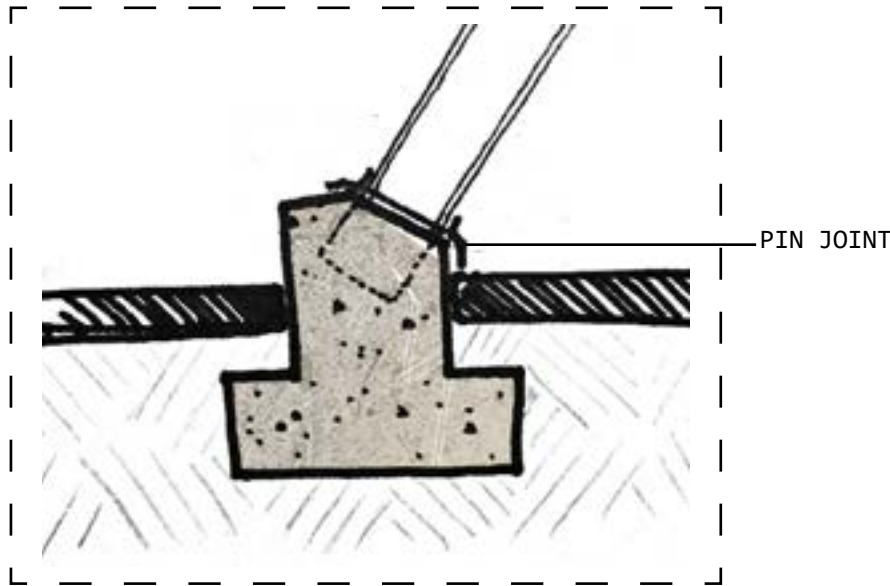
I: [DETAIL 2] Steel column foundation (Author, 2021)
